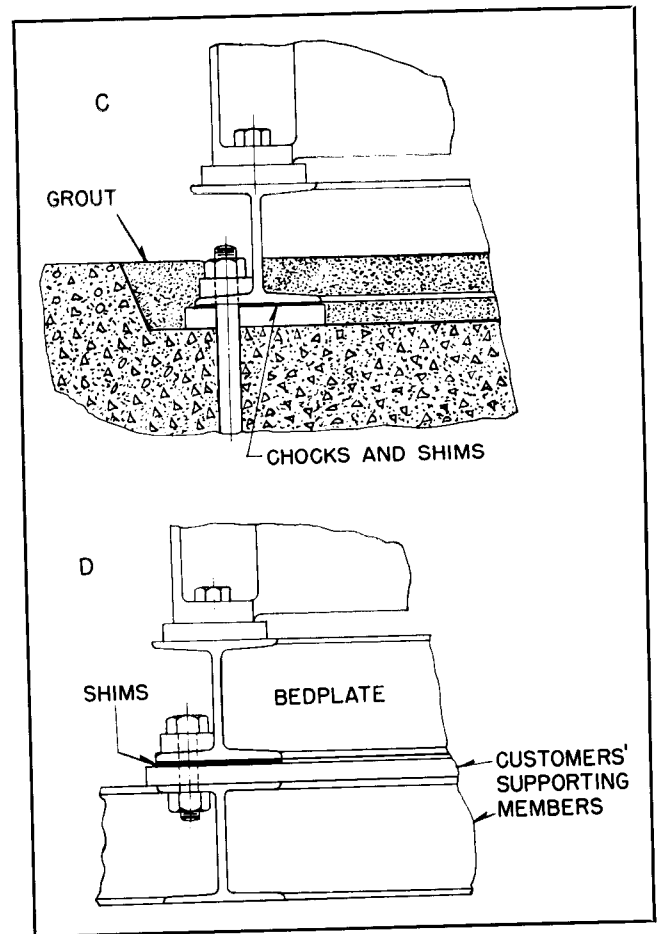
A. Typical Foundation Details for Mounting Reducer—Motor—Bedplate Combination
